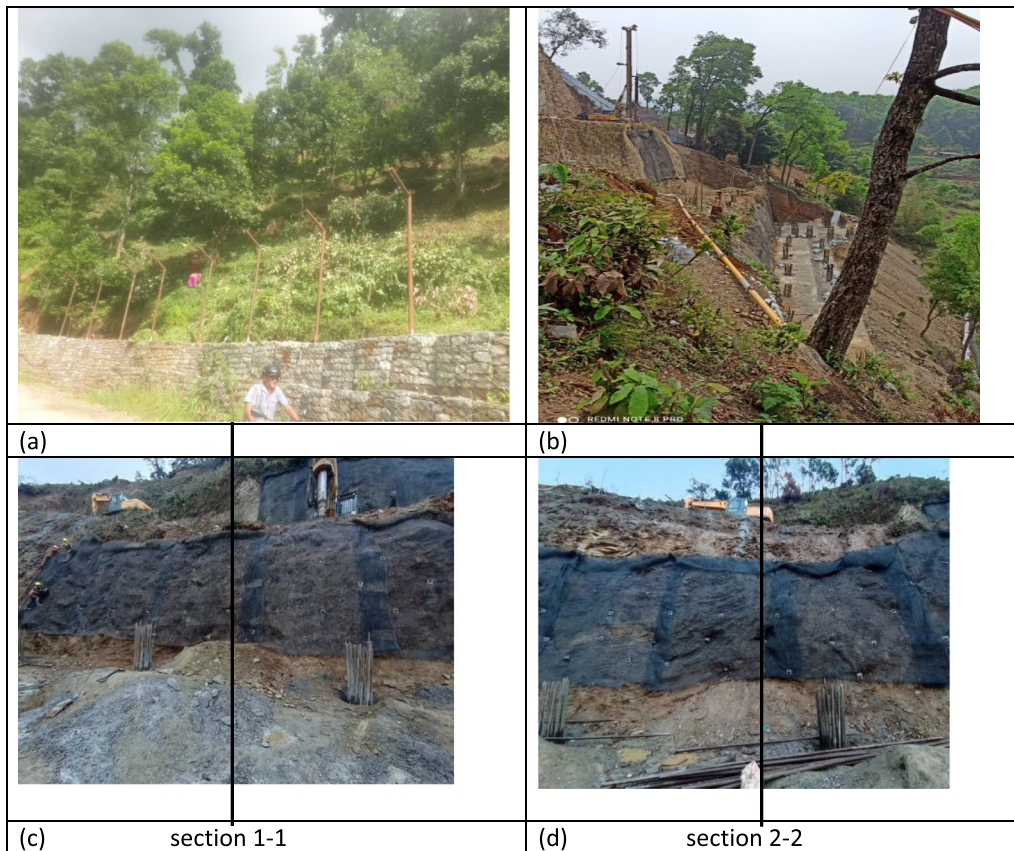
a Steep slope of construction Site, b Study area after cutting, c Ongoing construction on site, d Another view of ongoing construction of site
